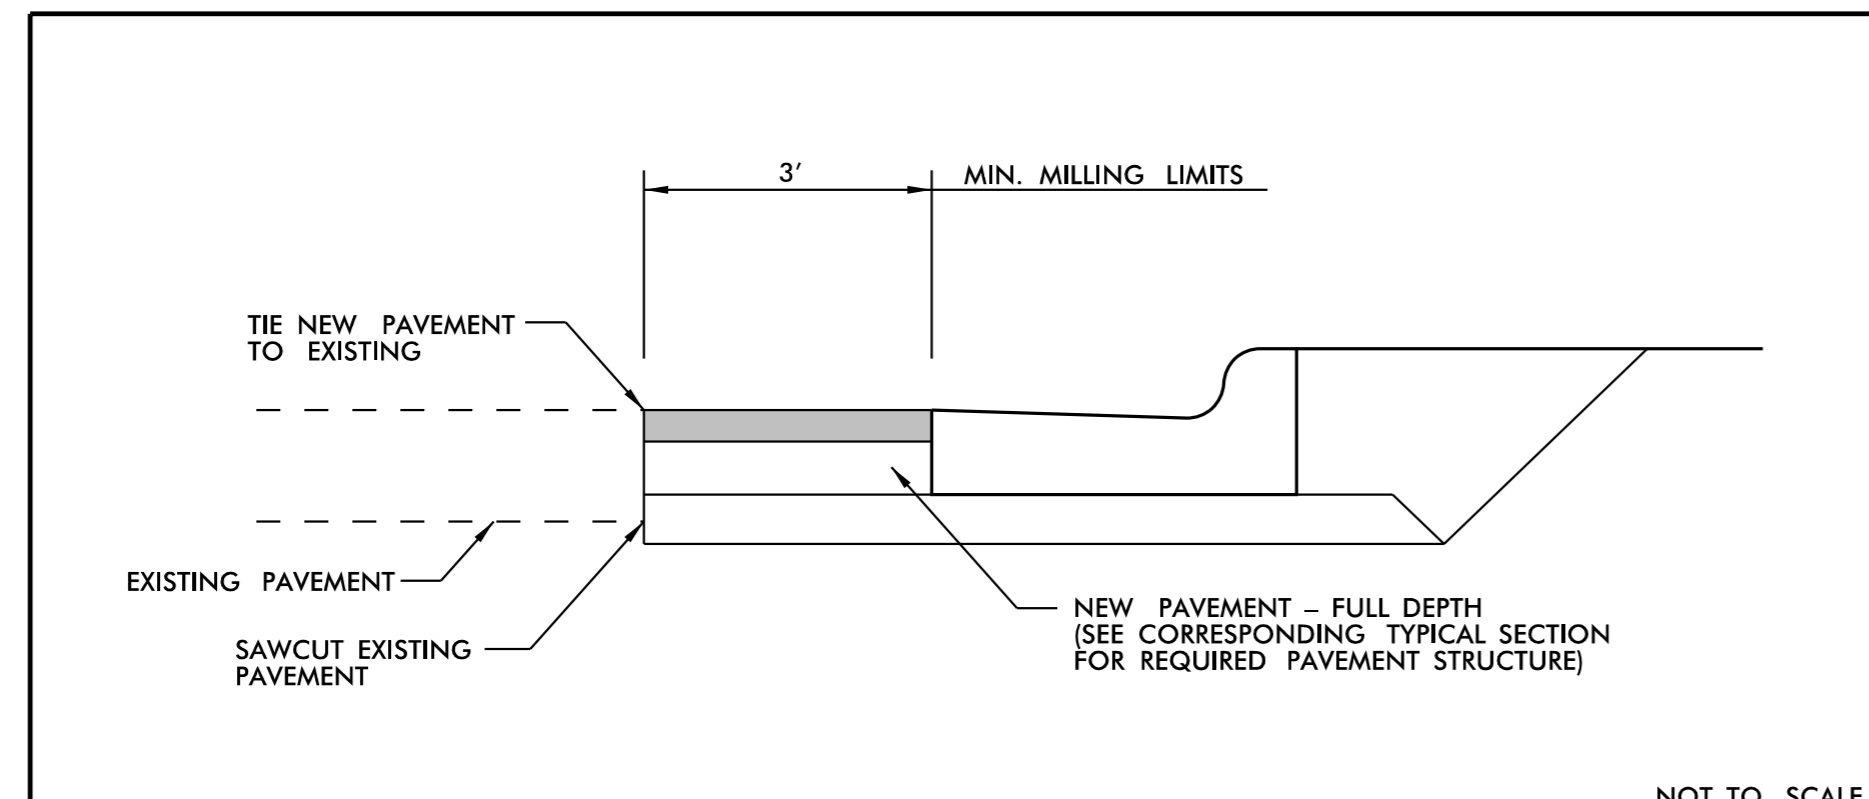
CURB & GUTTER FLARE TYPE 1
